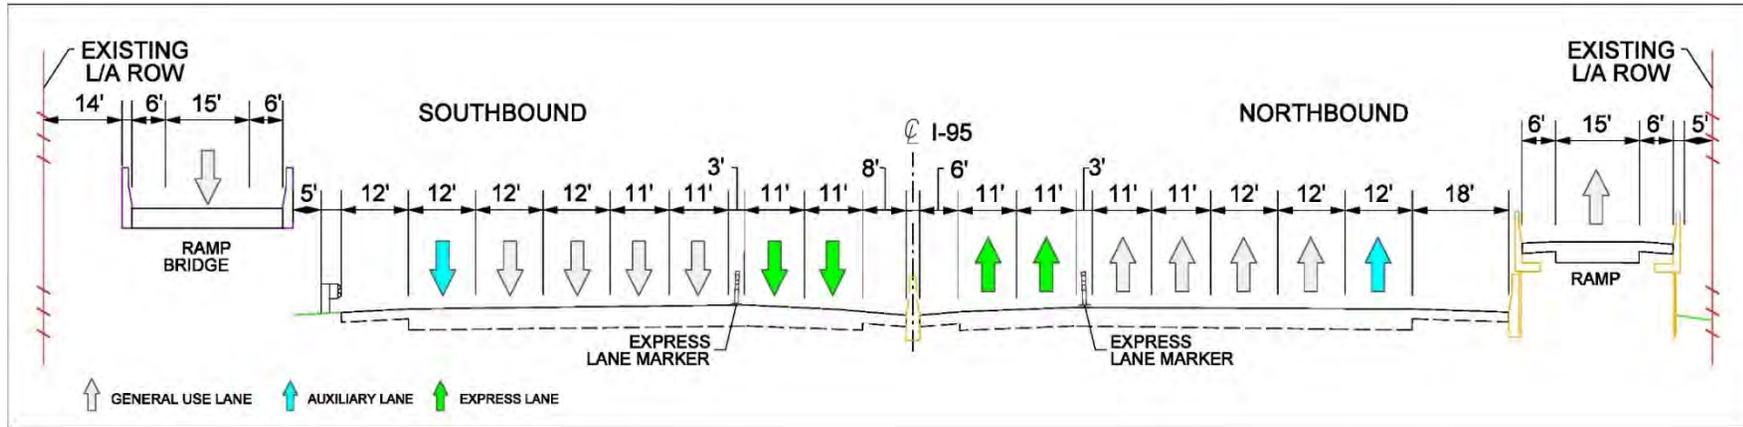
I-95 Alternative 1 Roadway Section North of Hallandale Beach Boulevard
